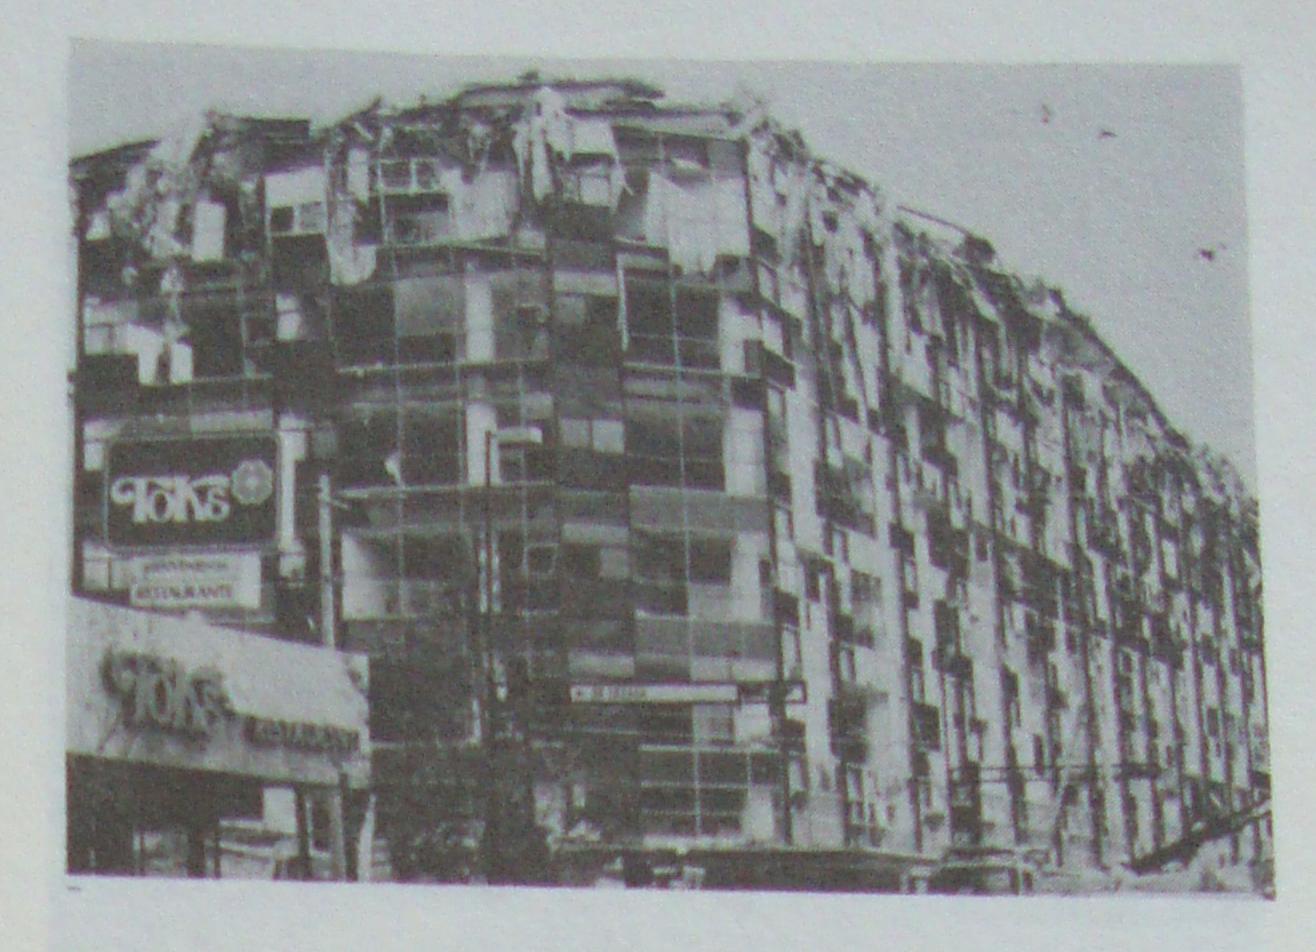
Failure of top storey of a large structure due to pounding of adjacent wings.
